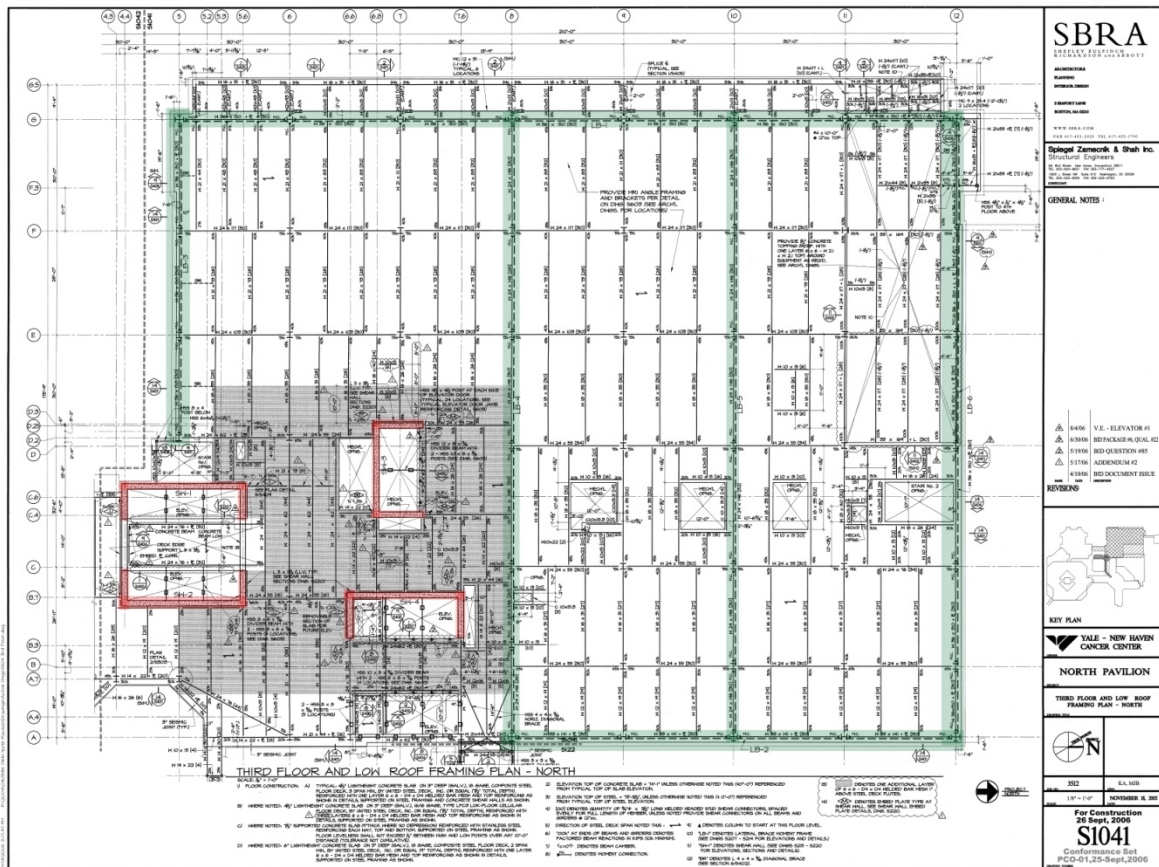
Typical Framing Plan for Levels 1-5. Green denotes Moment Frames; Red denotes Shear Walls.
